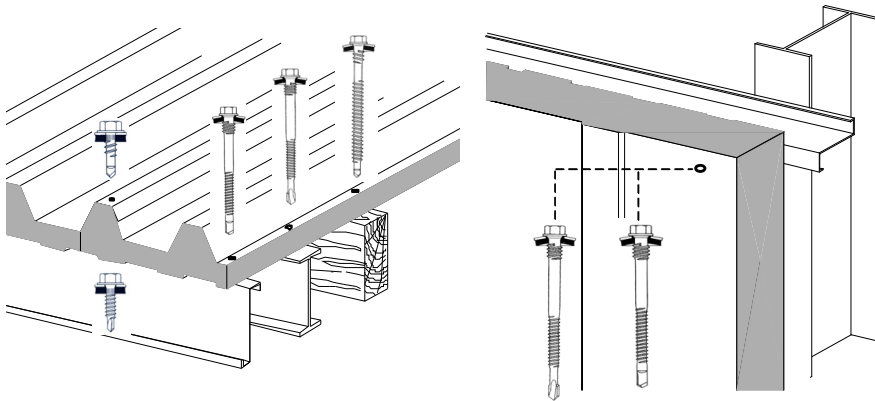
Screws used to fastening sandwich panels (SFS Intec AG, <http://www.sfsintec.biz>)
